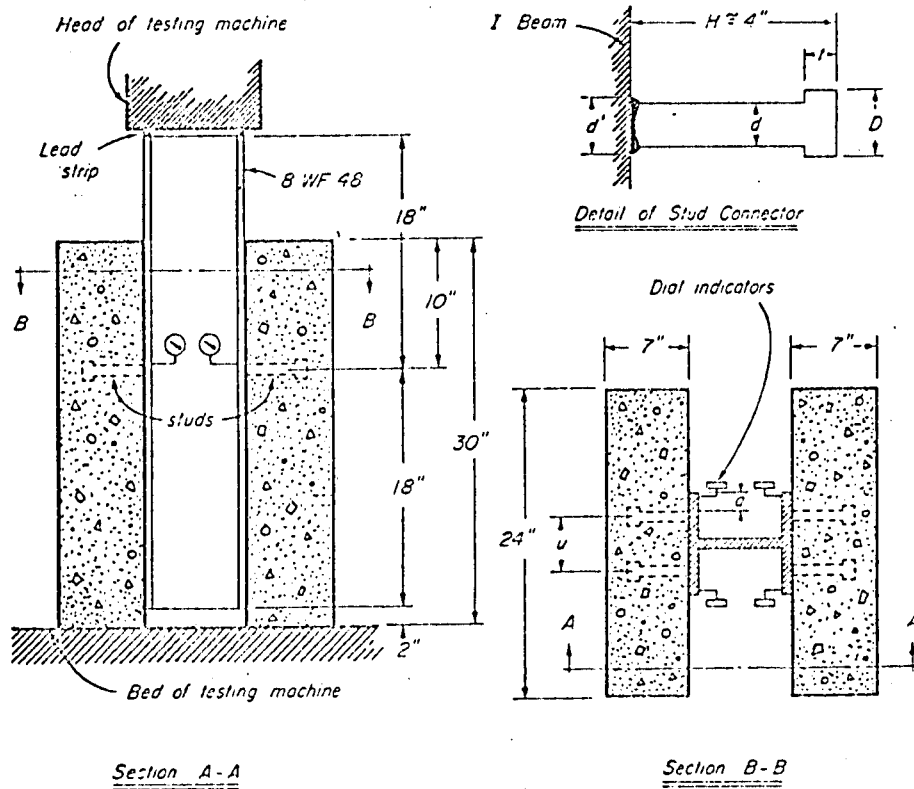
DETAILS OF PUSH-OUT SPECIMENS TEST SET-UP
